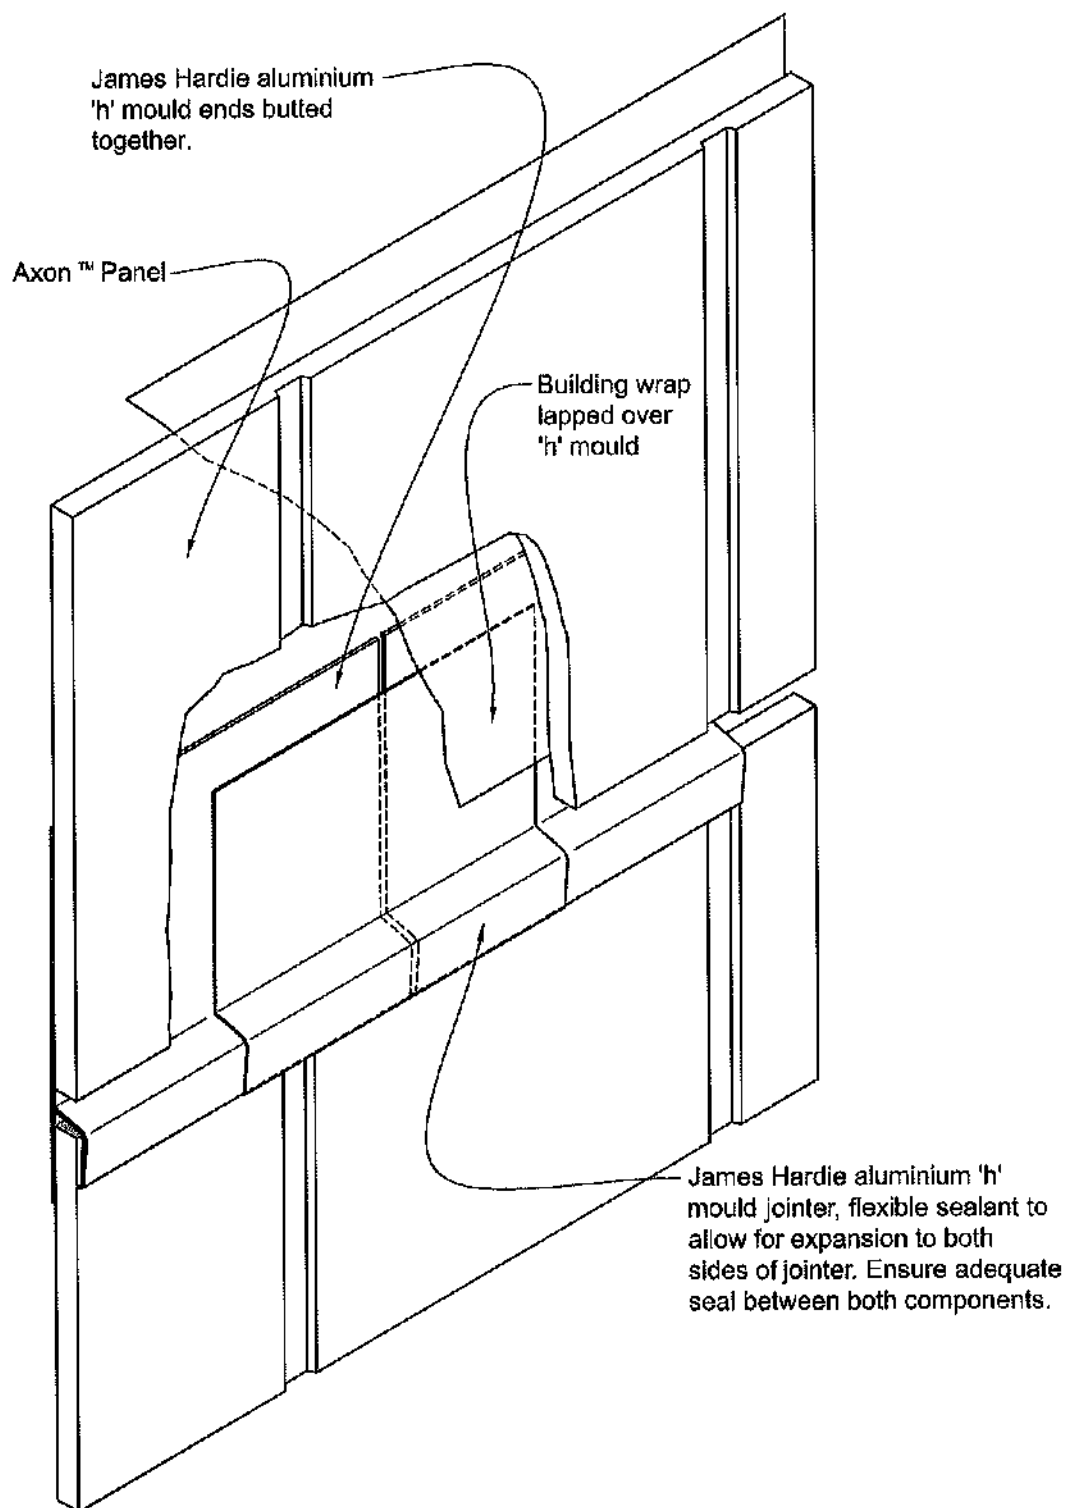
ALUMINIUM 'H' MOULD JOINTER
